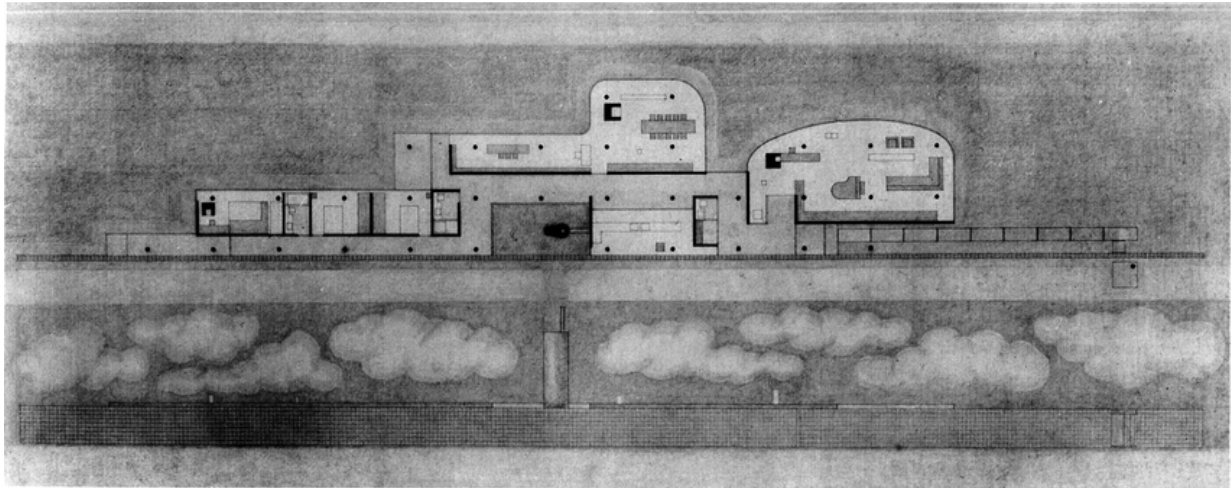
John Hejduk: Grandfather Wall House, 1966-76
